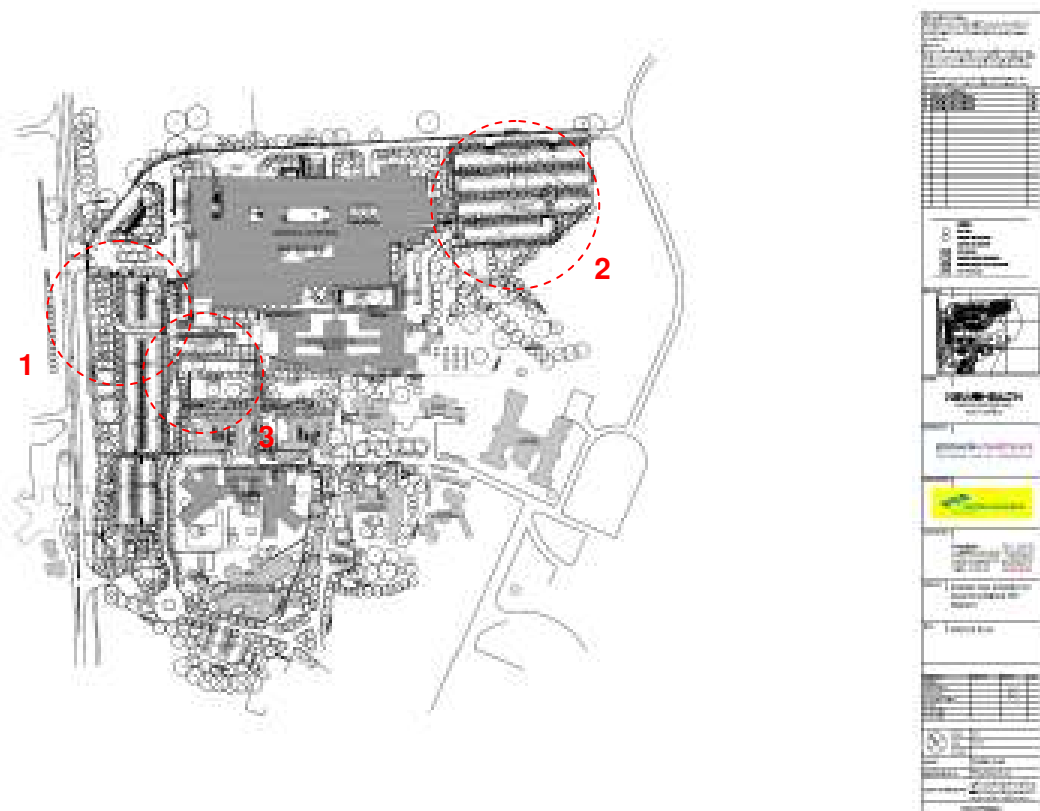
Modified Scheme - Master Plan, On Site Parking (SK-SP-01.01)
